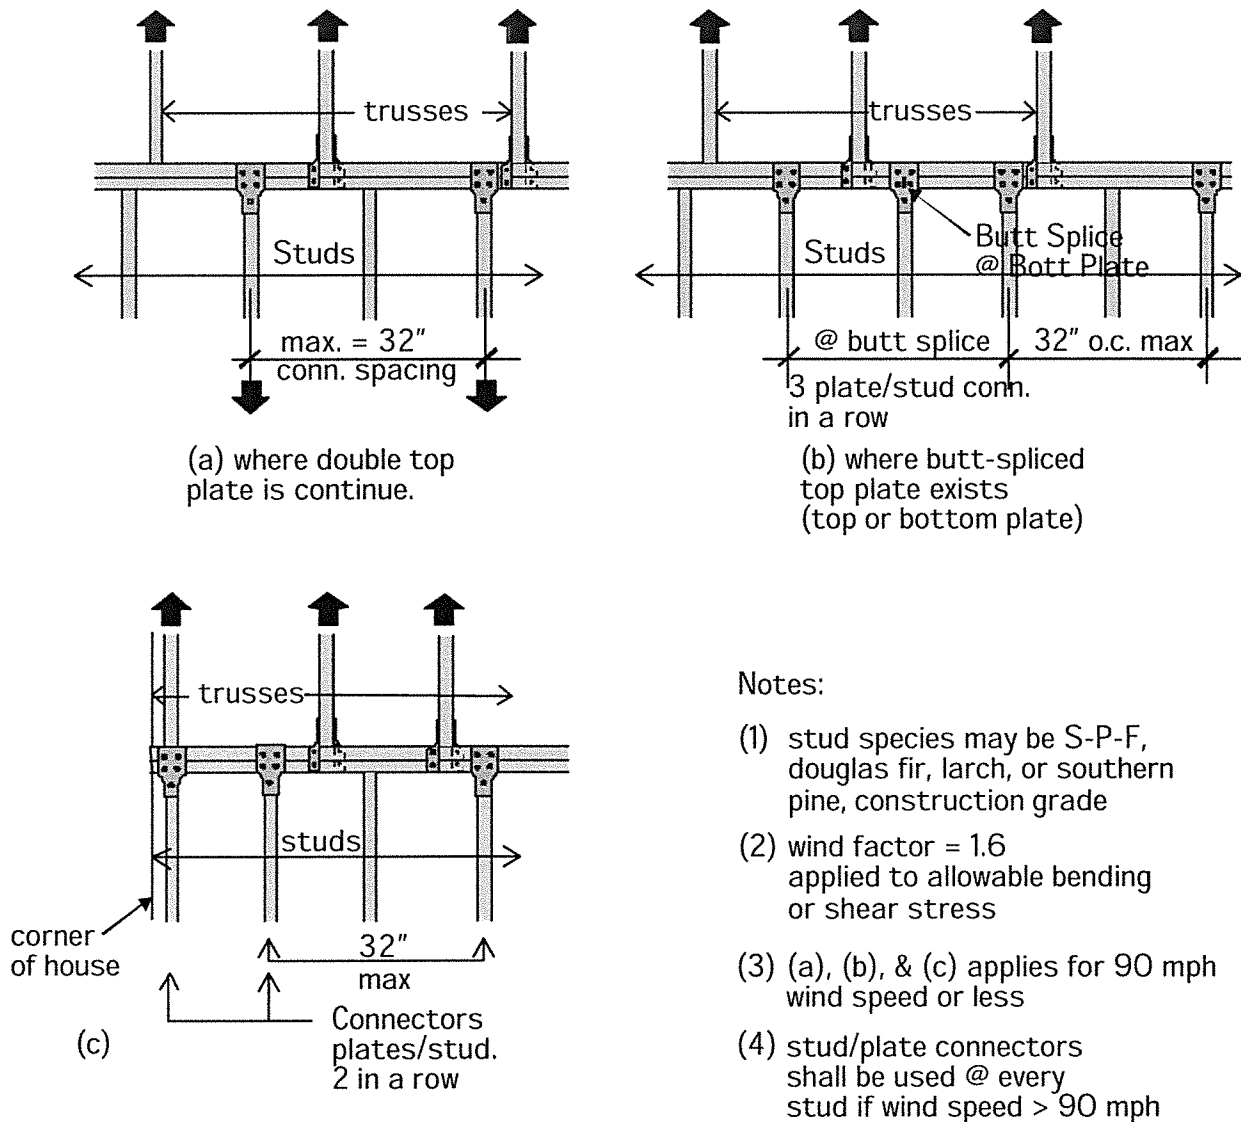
Acceptable Metal Connector Arrangements Between Stud & Double Top Plate
